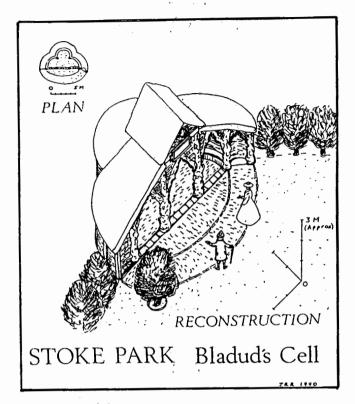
Conjectural reconstruction of "Bladud's Cell" based on plan by Thomas Wright (top left).
